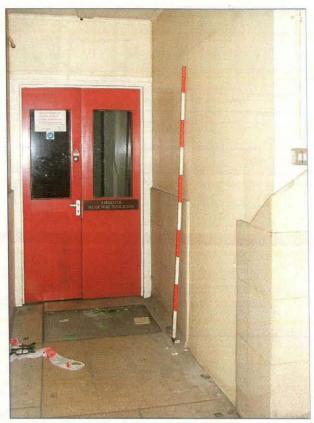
Former doorway to office as seen from the base of the stairs at ground floor level (Scale = 2m)
